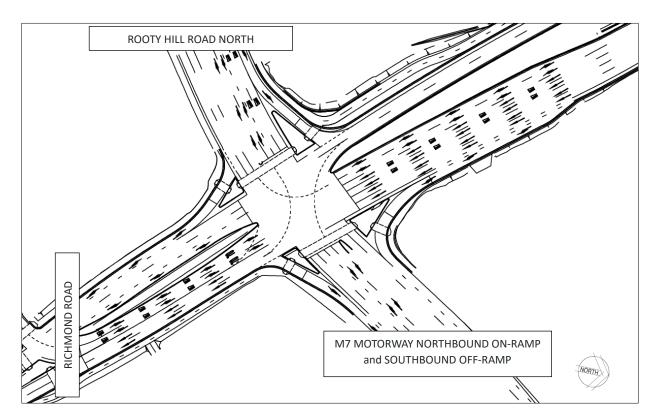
Plan view of the proposed Richmond Road / Rooty Hill Road North intersection
